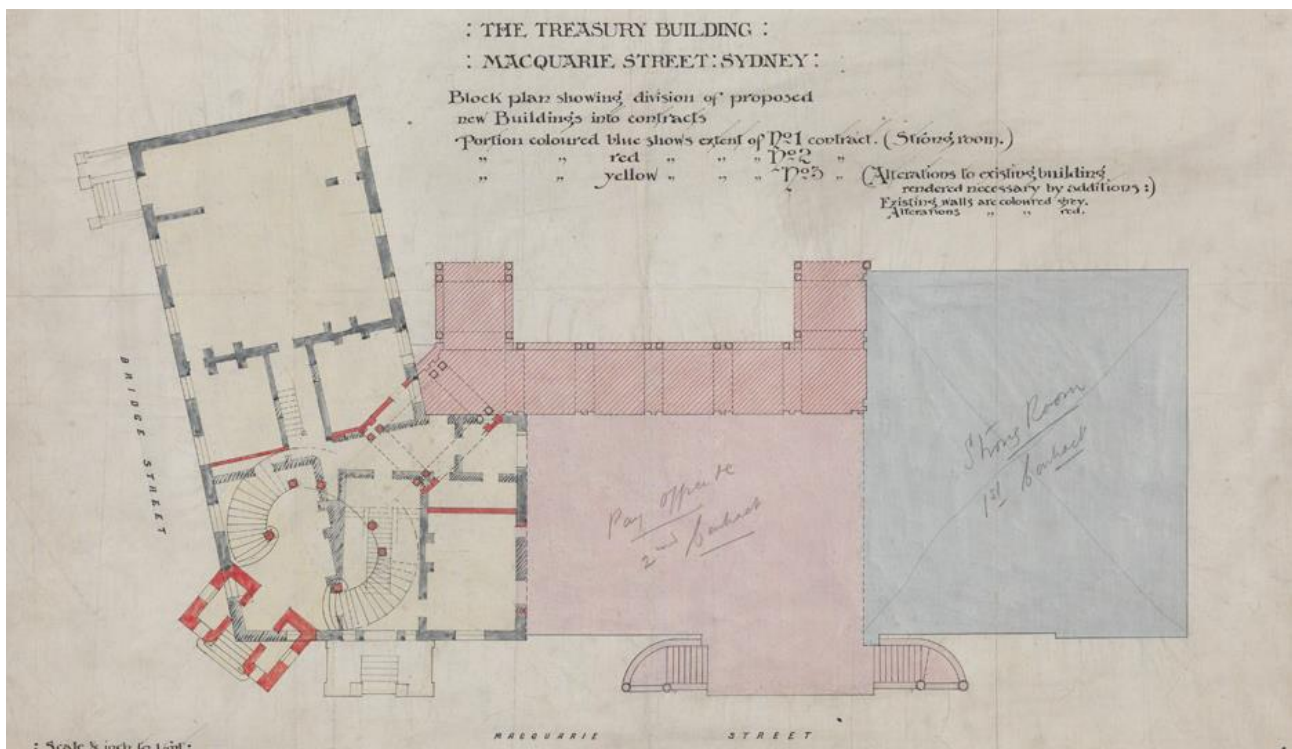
Extract of Architectural Plan for Proposed Additions to Treasury (showing proposed reconfiguration of existing Treasury Building which did not proceed)
